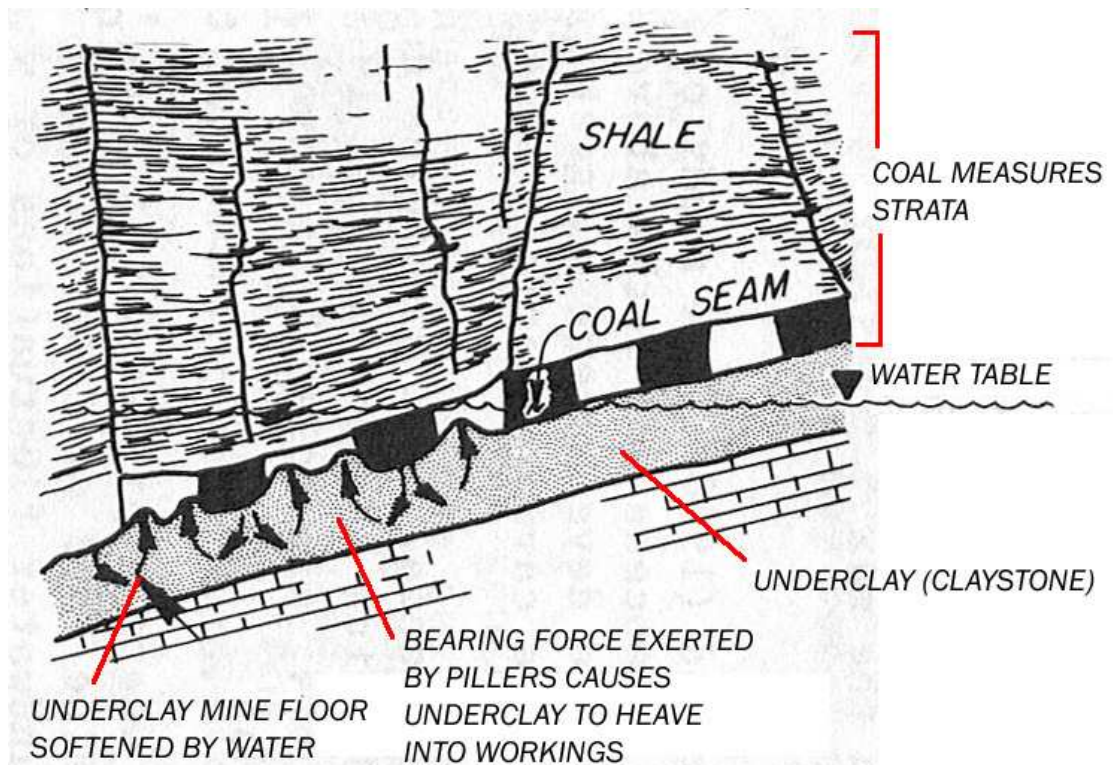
Floor heave due to clay softening at base of pillars (after Gray, 1988).
